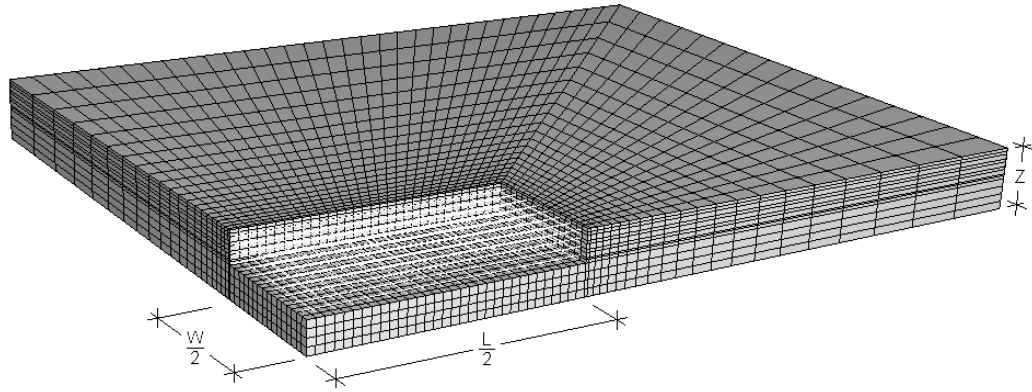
3-D Finite Element Model of a Deep Excavation
